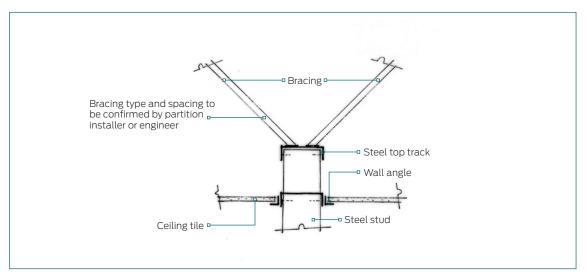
Generic internal wall bracing connection - wall terminates above ceiling.
